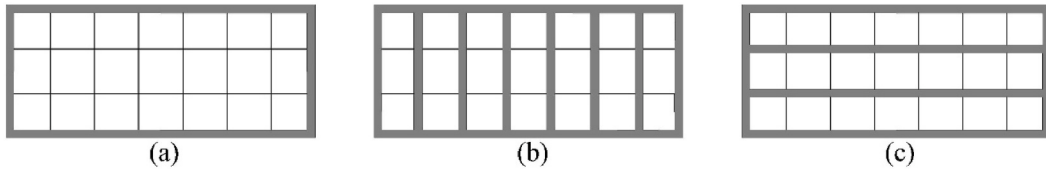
Different configurations of the roof retrofit beams: (a) RP; (b) RY; (c) RX.
